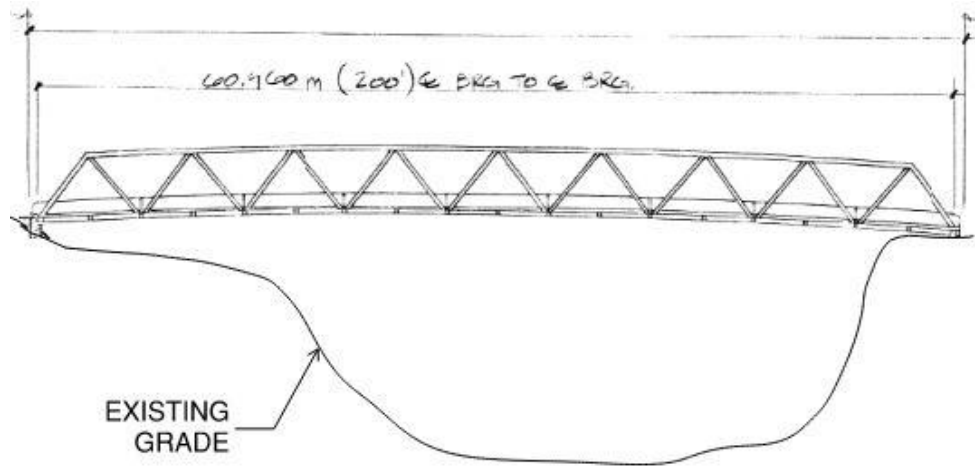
RELOCATED BRIDGE ELEVATION (GLACIER CREEK GRADE SHOWN)
